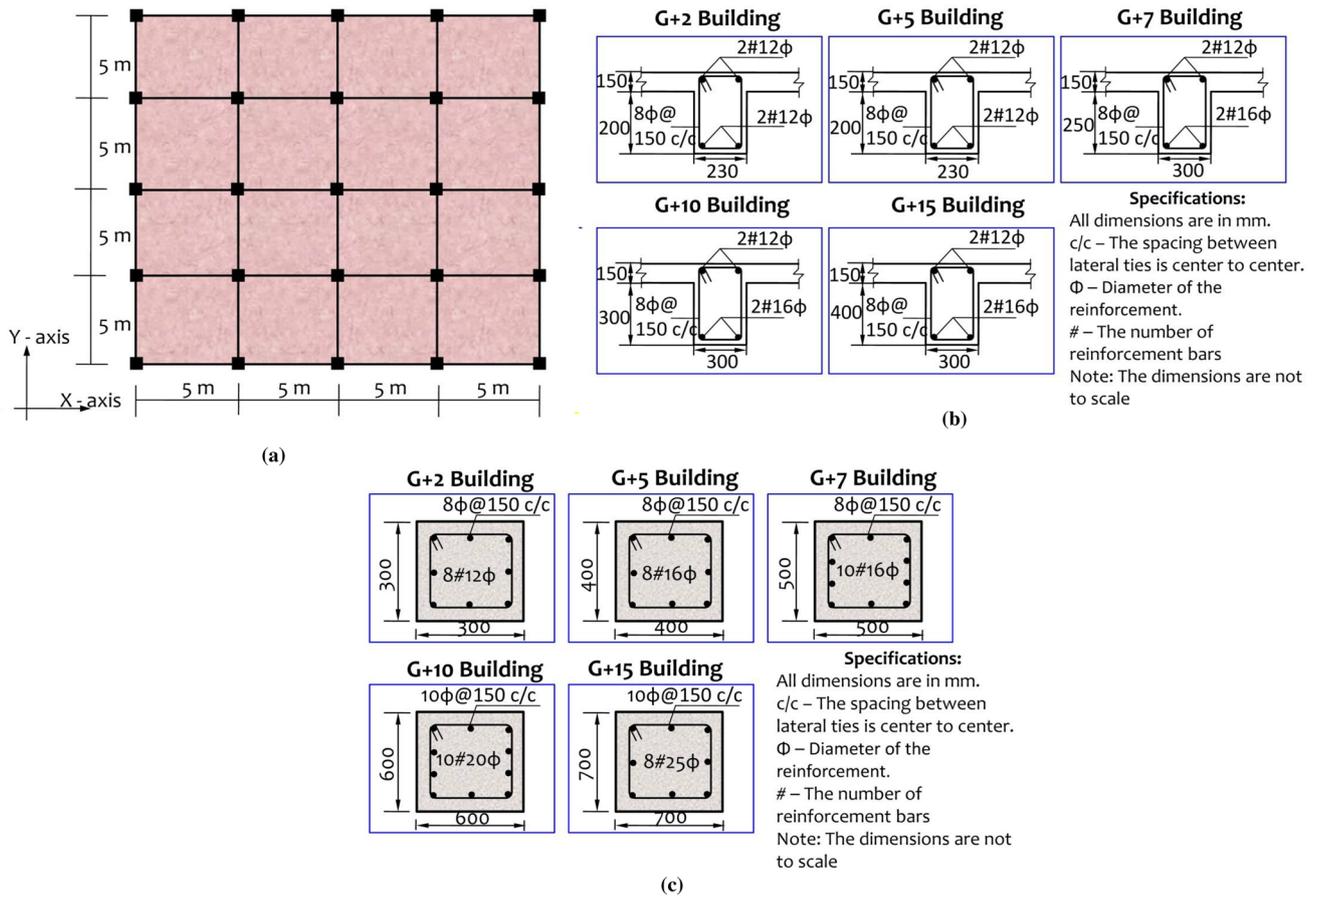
Building details considered in the analysis a plan, b column reinforcement detailing, and c beam reinforcement detailing
